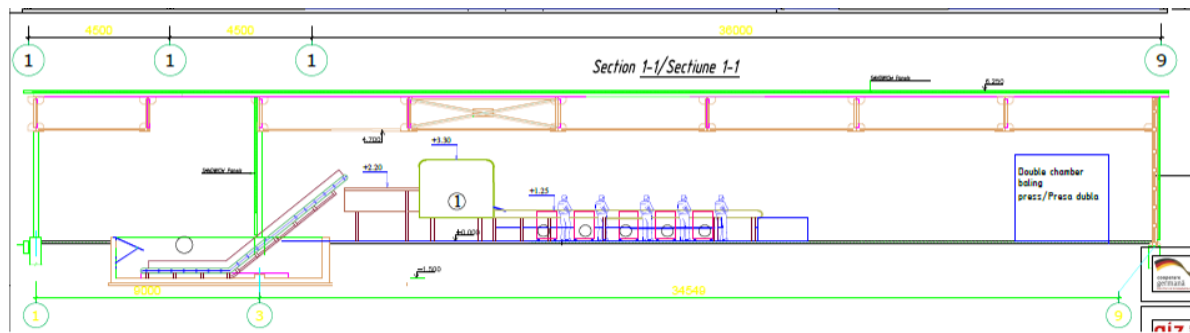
shows a practical example of the proposed equipment in an open, roofed facility.
